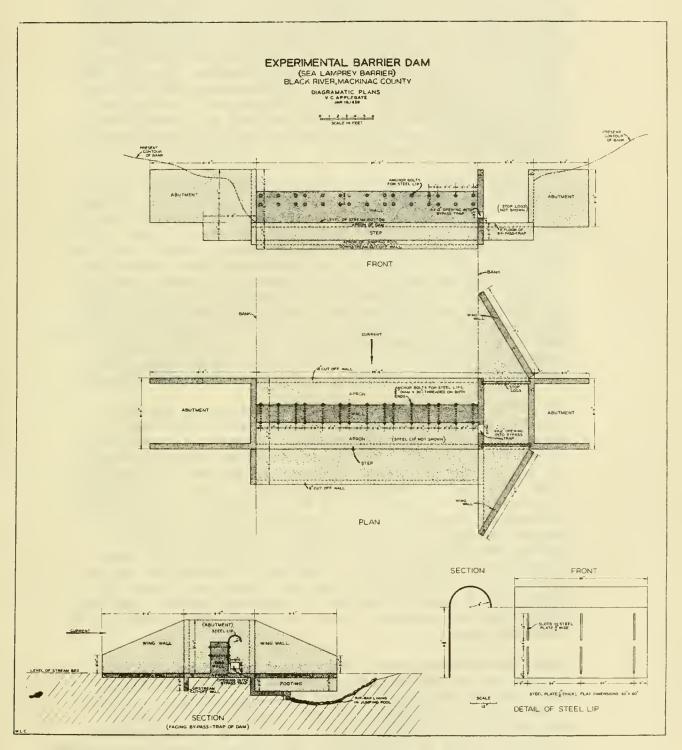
Diagrammatic plans of a sea-lamprey barrier dam(meinforcing details not shown).
